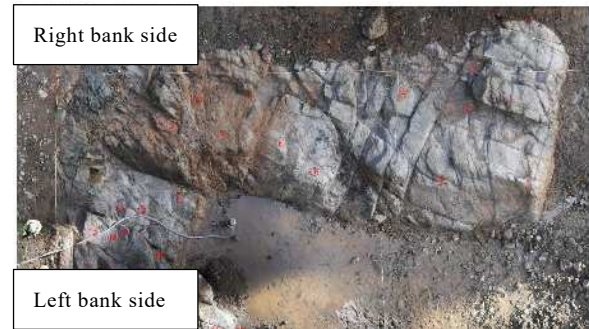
Orthophoto of the Excavation Face of the Riverbed Section
